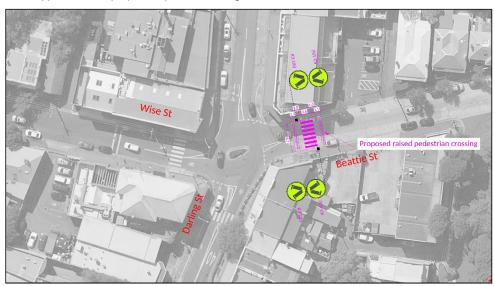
Darling Street / Wise Street / Beattie Street proposal.
